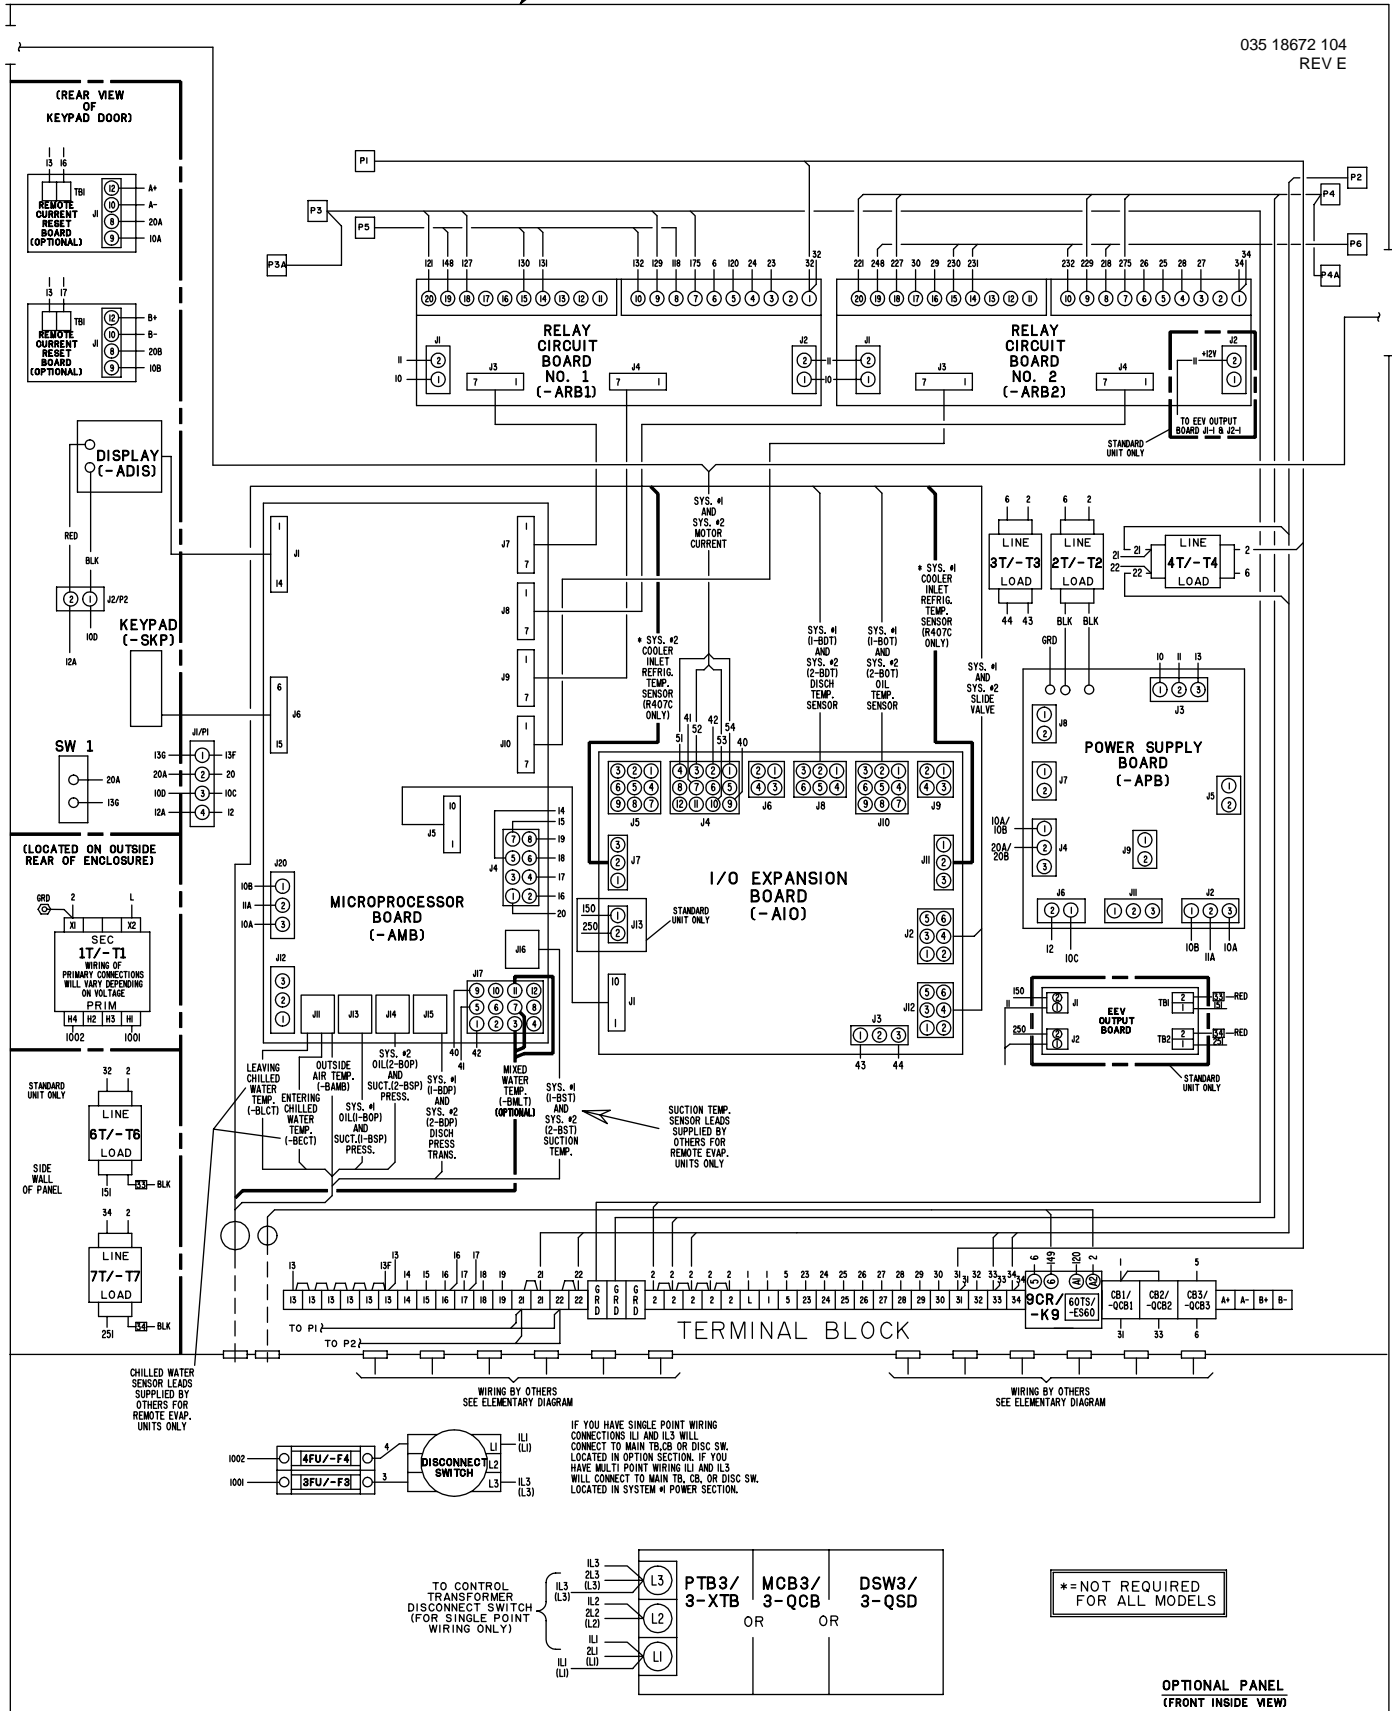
CONTROL PANEL COMPONENT LOCATION
